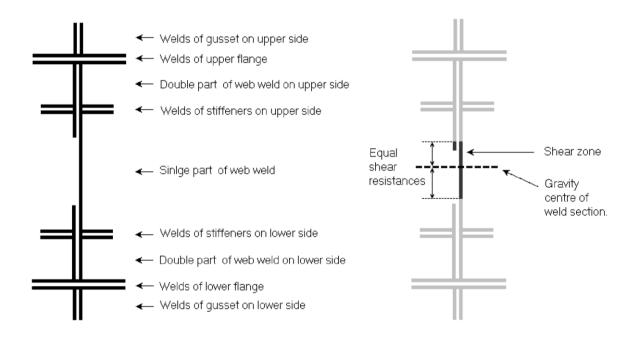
weld section: geometry (example) and web part for shear transmission
